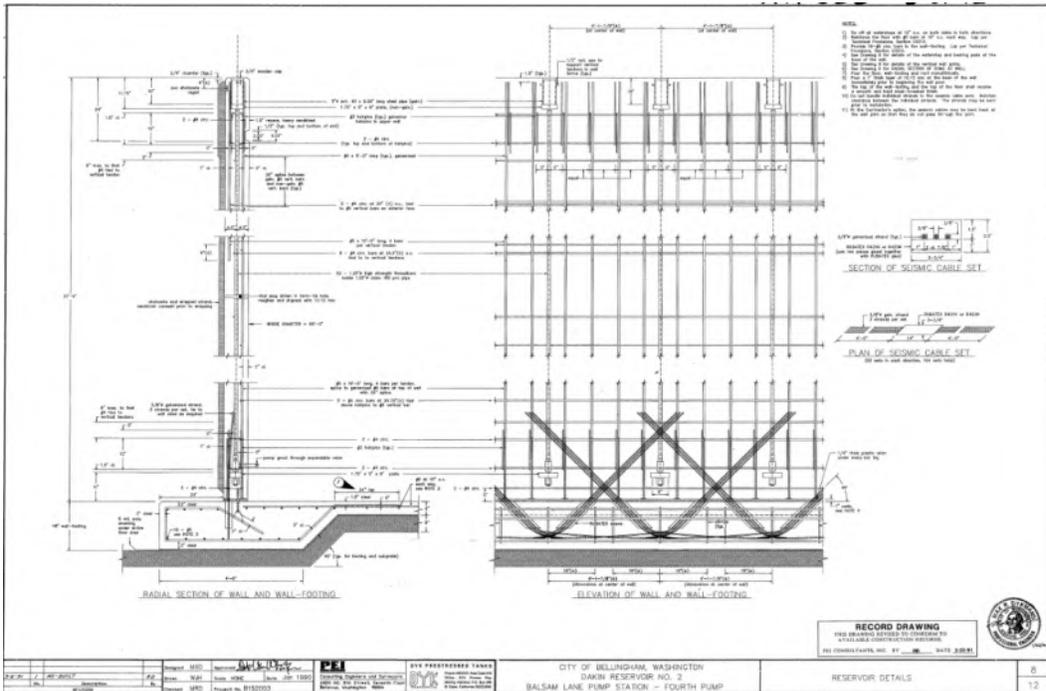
Dakin 2 – Reservoir Details, Sheet 8
